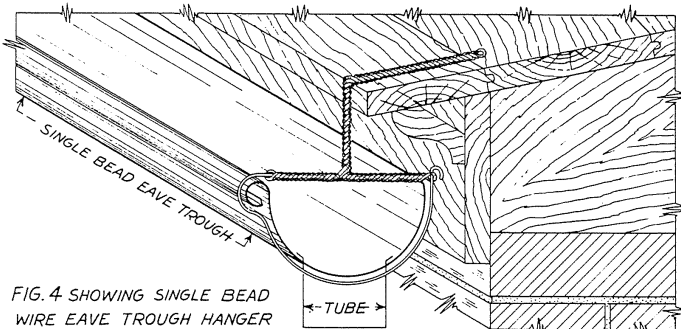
SHOWING SINGLE BEAD WIRE EAVE TROUGH HANGER
